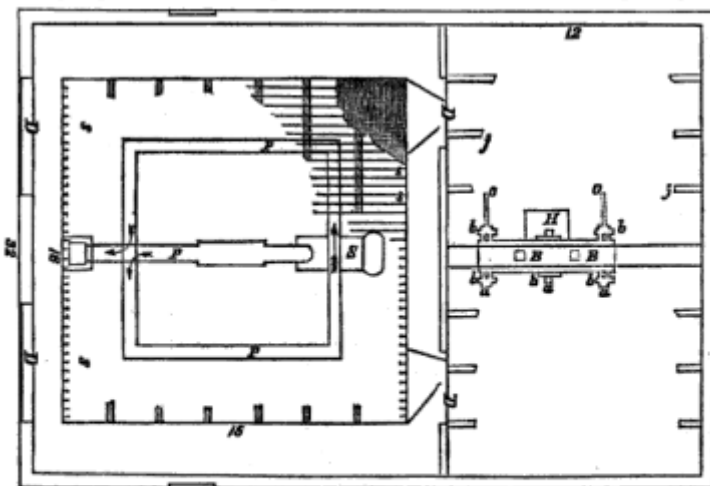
GROUND PLAN OF HOP-HOUSE.
